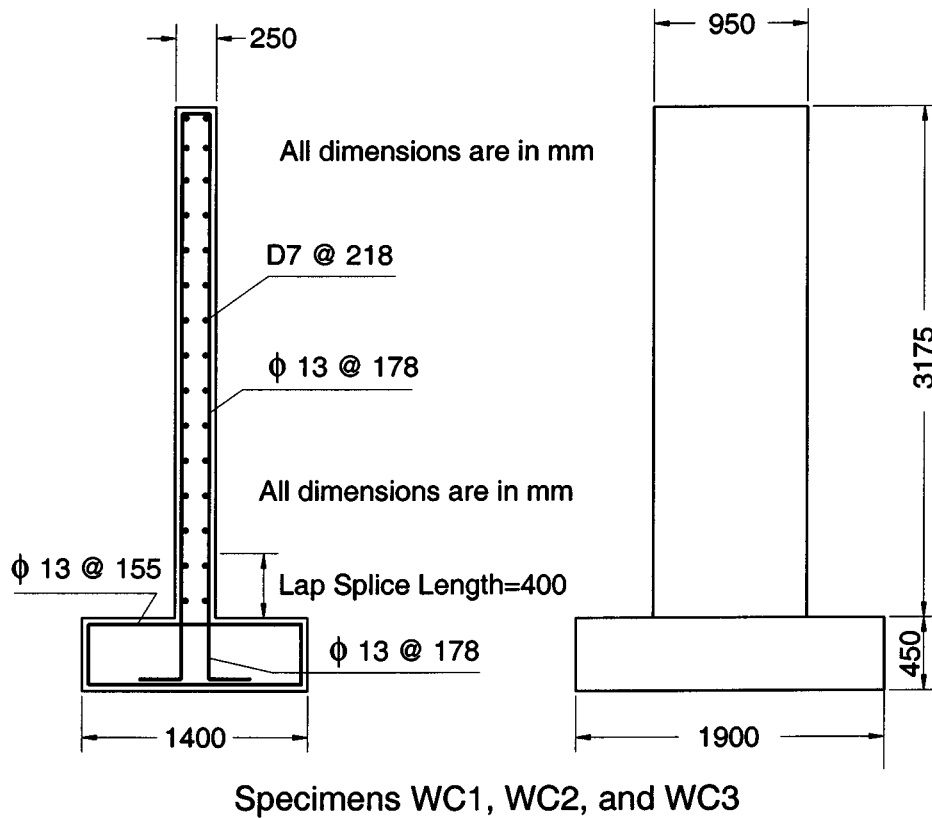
Details of Wall Specimens Tested at UC-Irvine (Reference 8)
